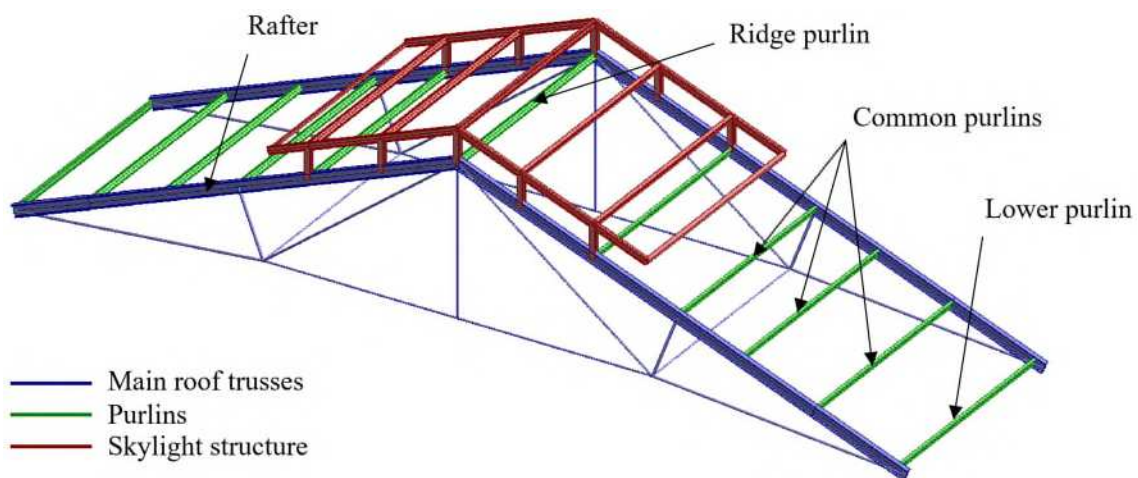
Schematic view of a metallic roof structure with designation of relevant structural elements.
